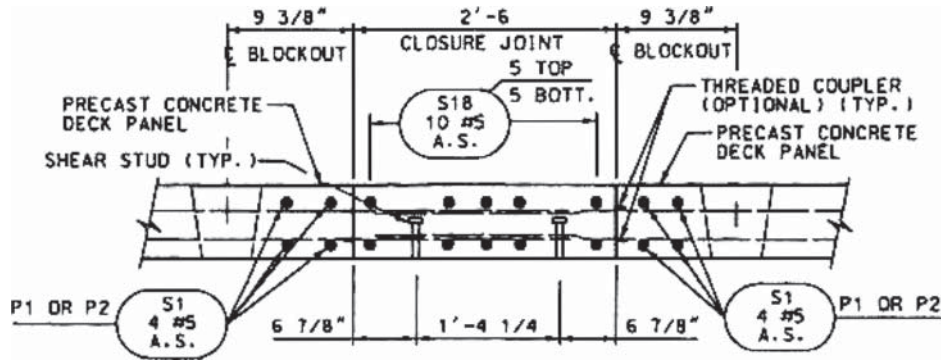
Lap splicing of longitudinal reinforcement used on Structure C-437, Wanship, Utah.
